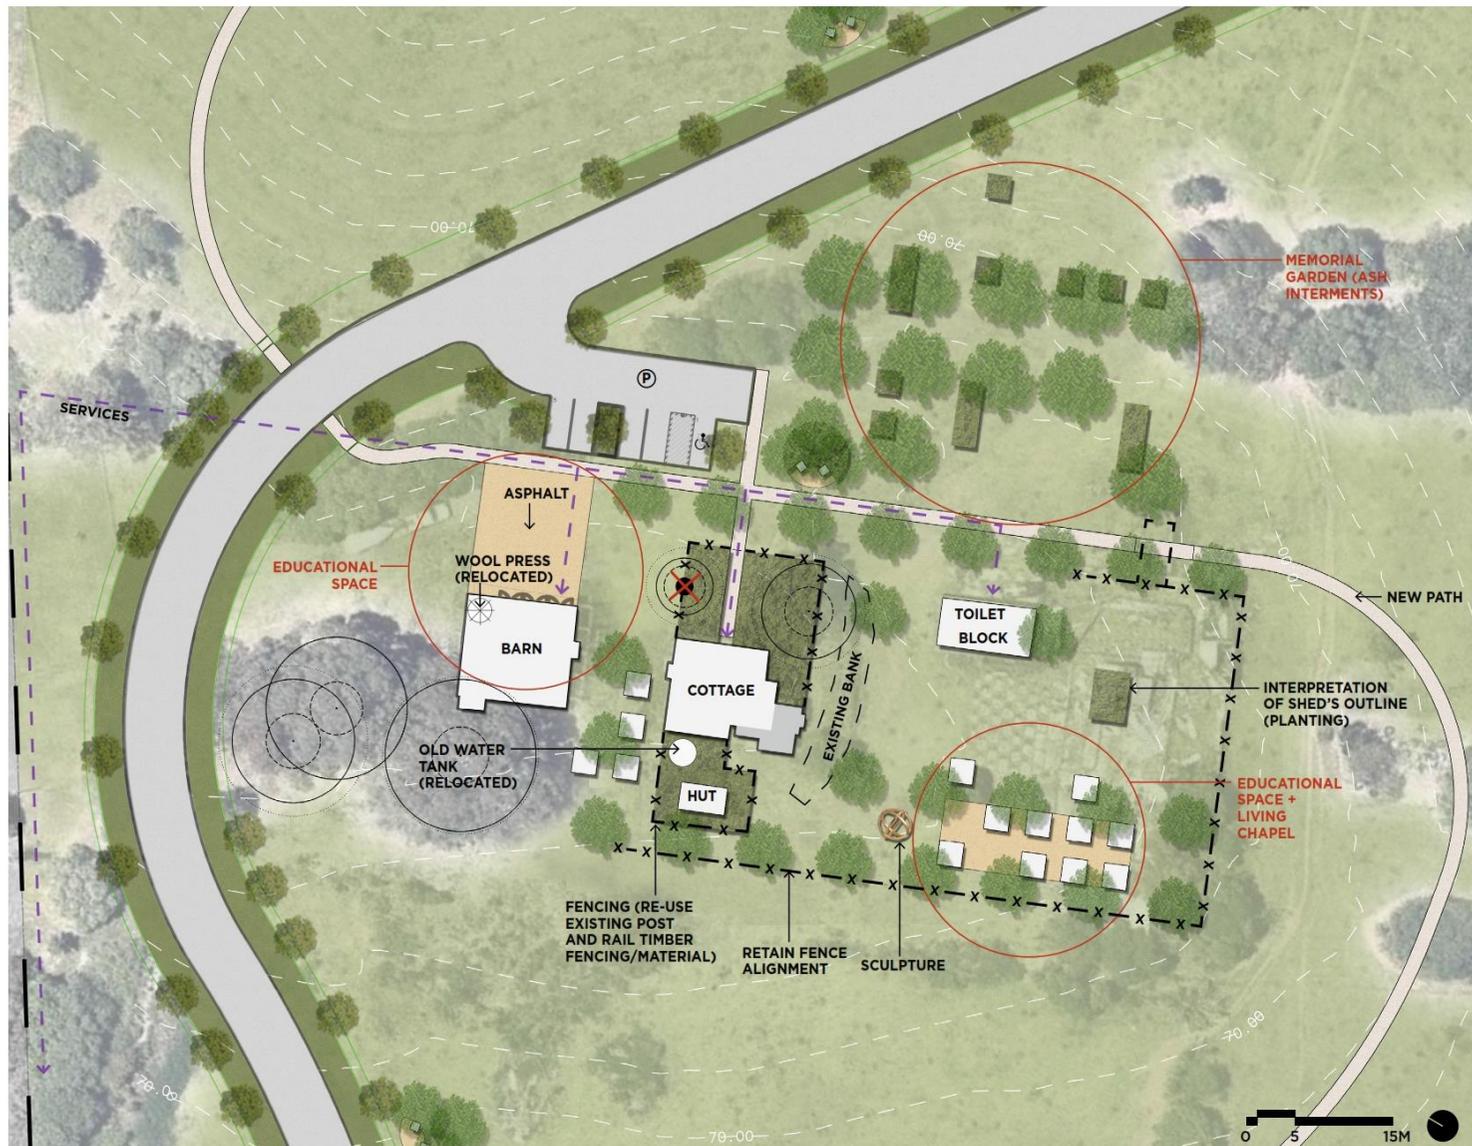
Proposed design plan for carriageway interpretation. Source. Florence Jaquet, Landscape Architect.
